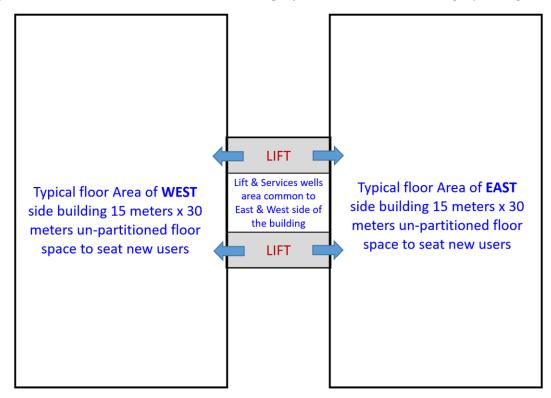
A Typical floor plan for structured cabling for LAN and WLAN
